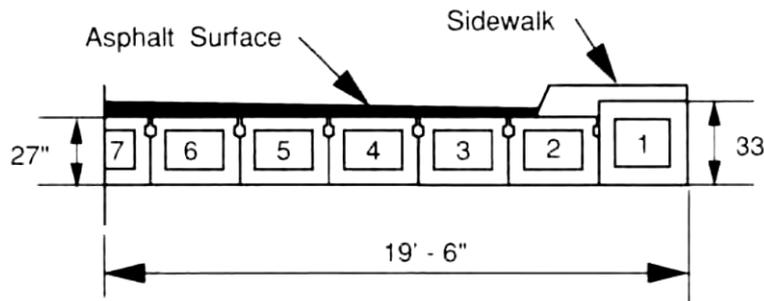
Walnut Street Bridge (ID-31) cross section, view of symmetric half from north end (Murray and Frantz, 1992).
